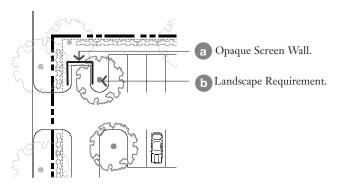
(1). Screening of Open Storage or Refuse Areas.
